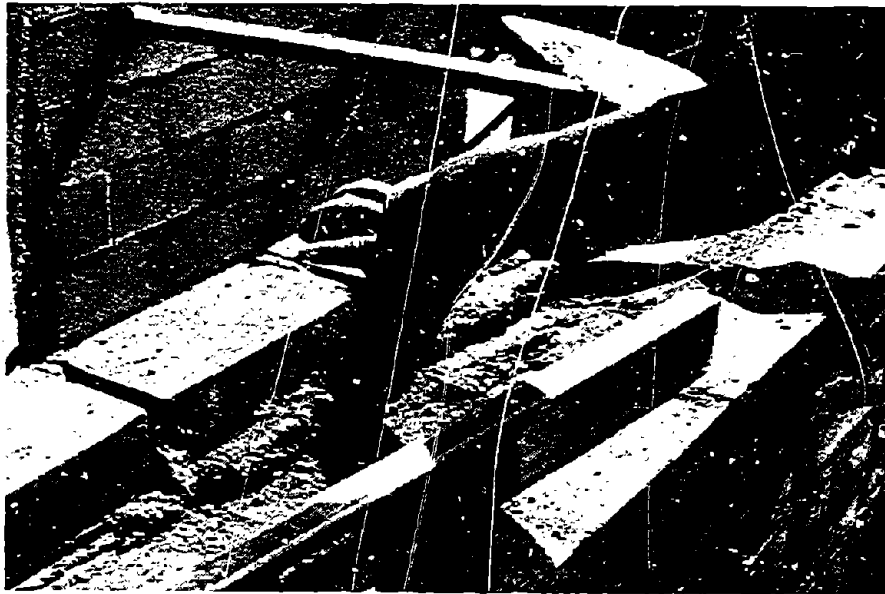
TRADITIONAL METHODS OF CONSTRUCTING MULTI-WYTHE MASONRY
